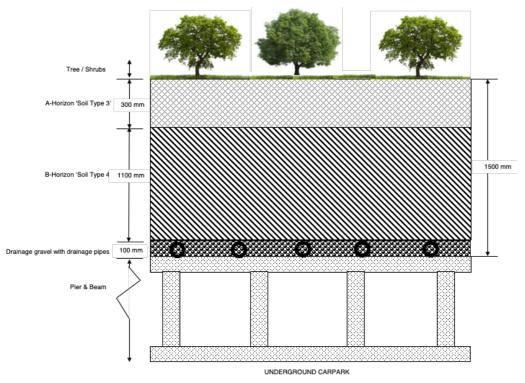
'Type 3' & Type 4 general planting standard weight soil profile.
